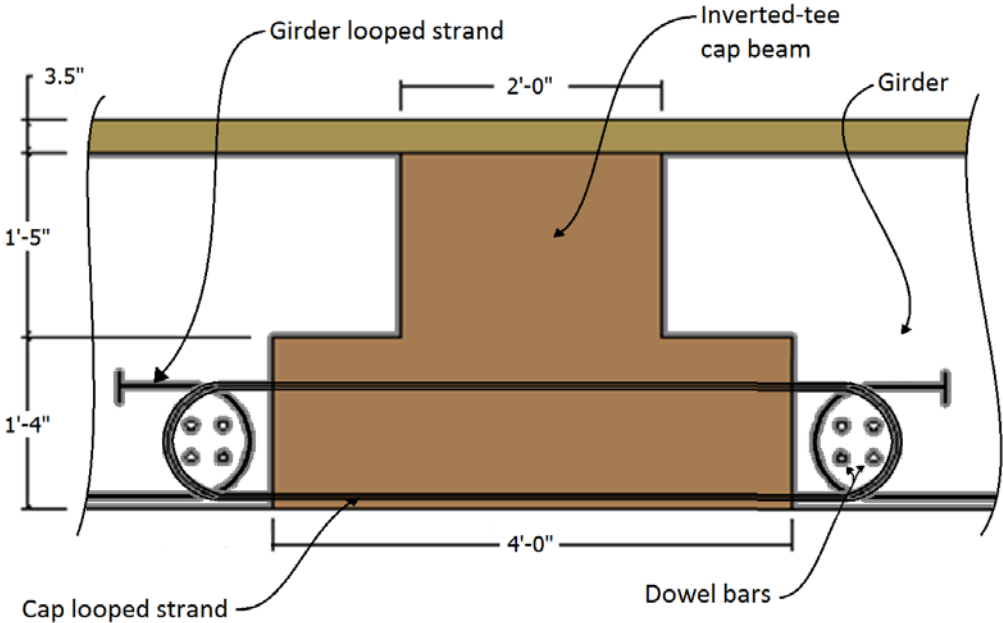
Looped unstressed strand connection (LUSC) detail
